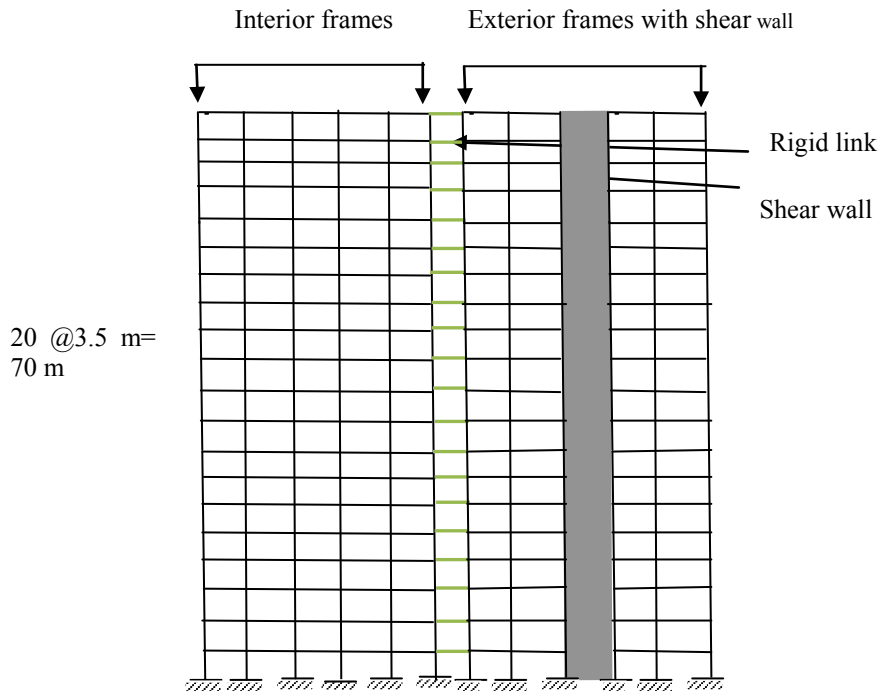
2-D plane frame model of 20 storey shear wall building
